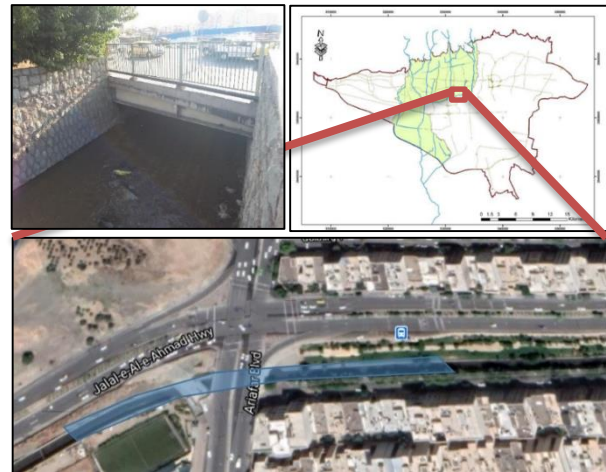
Study area (Ariaifar Boulevard Bridge)
